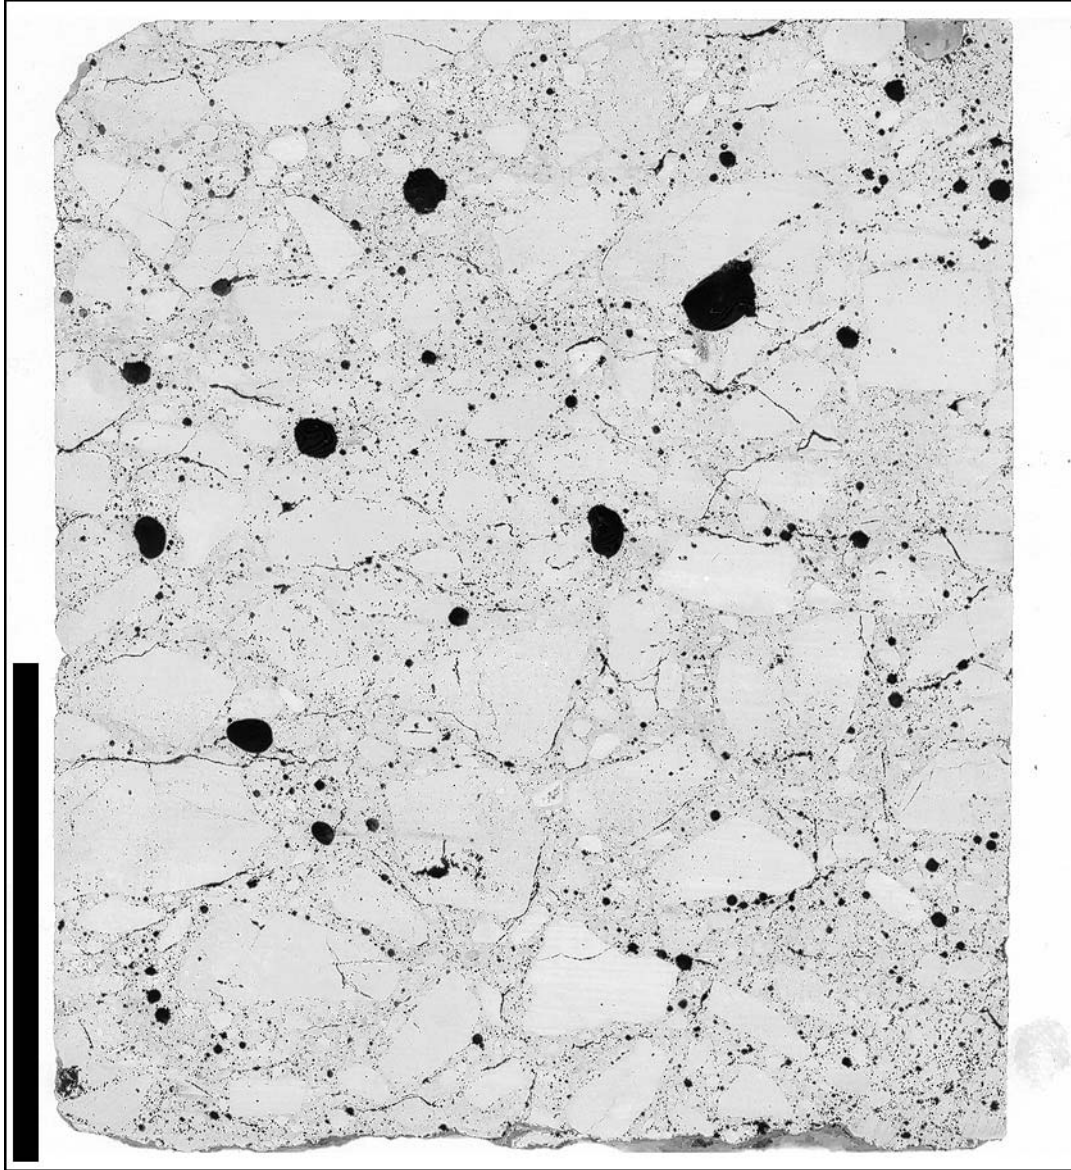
Close up of bottom half of sidewalk portion of core "2" to show cracks, scale bar 5 cm.
